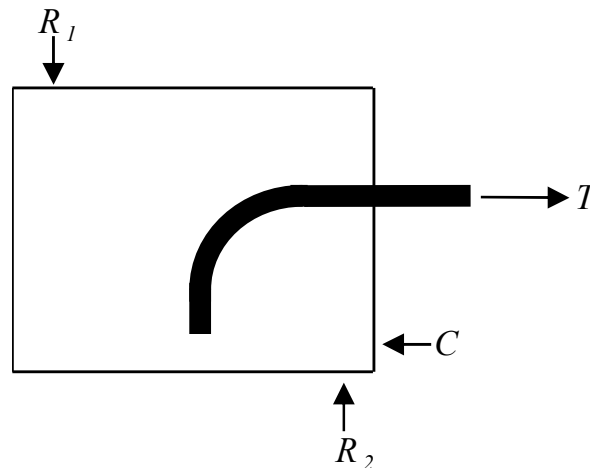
Free body diagram for modified cantilever beam specimen (modified from Minor and Jirsa 1975)
